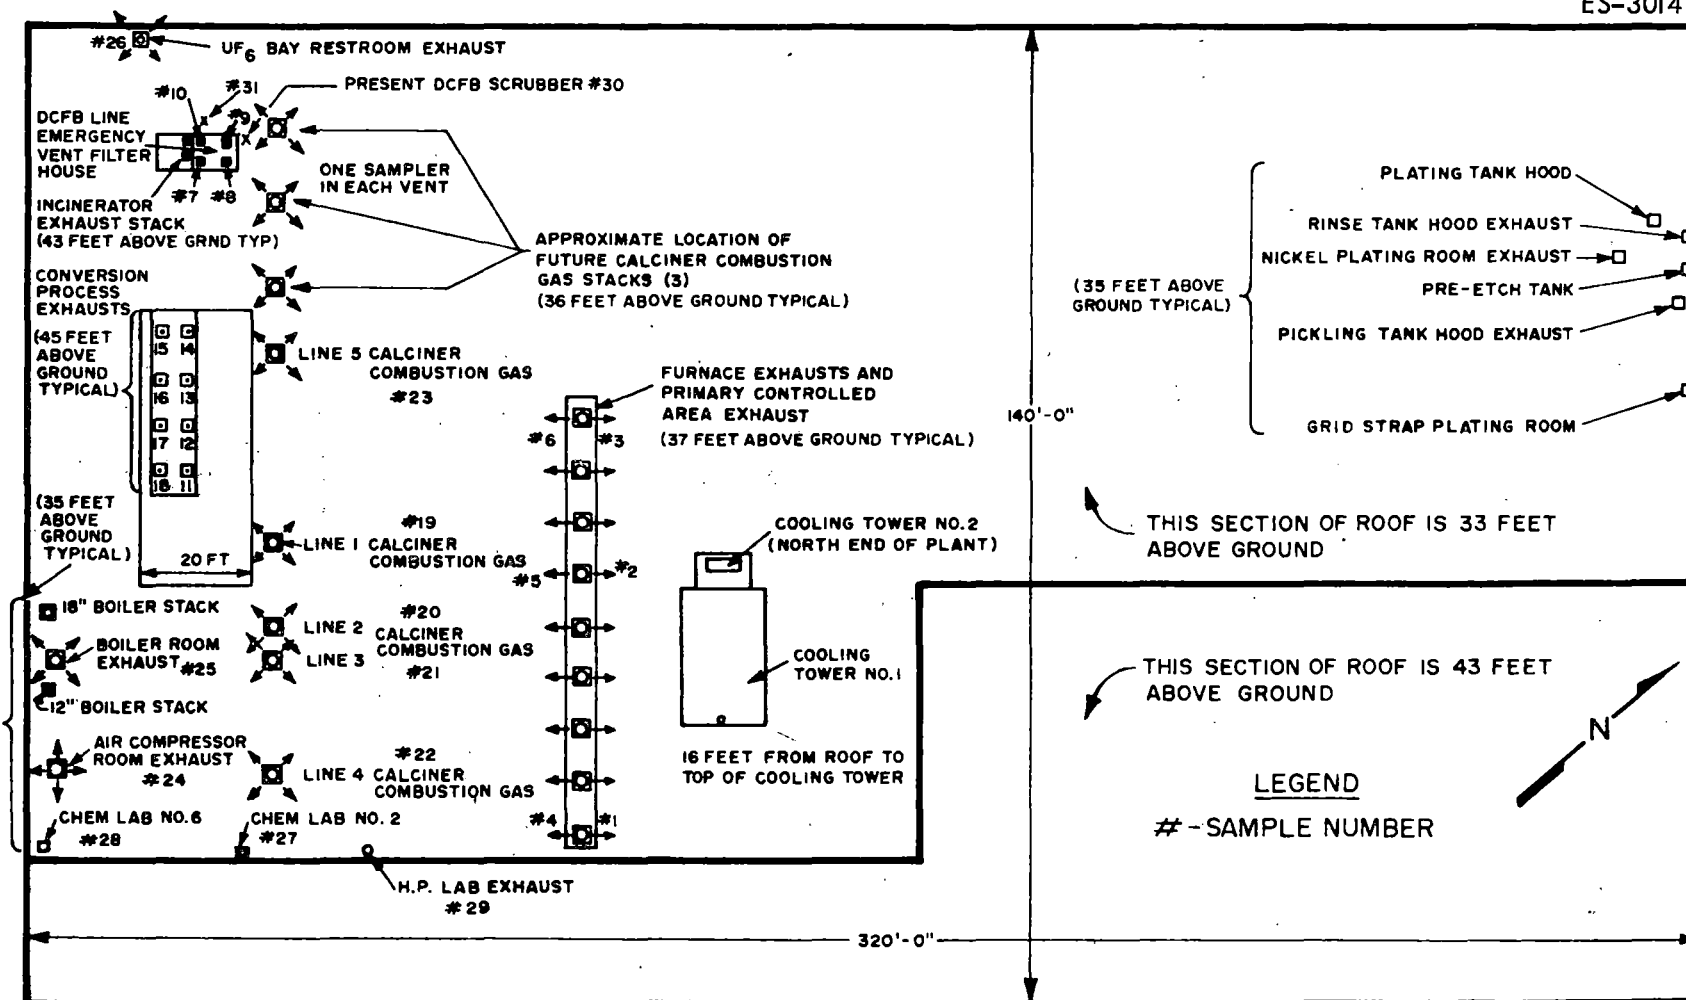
Process stack locations — roof plan. Source: ER, Fig. 3.3-1.
